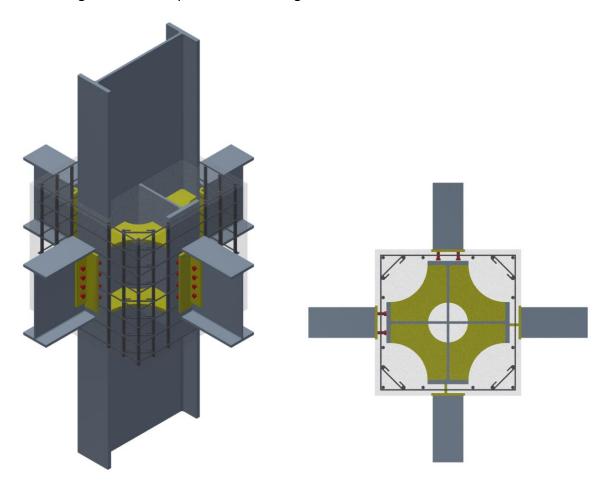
Simple connections between steel beams to concrete encased steel column with T-stub
